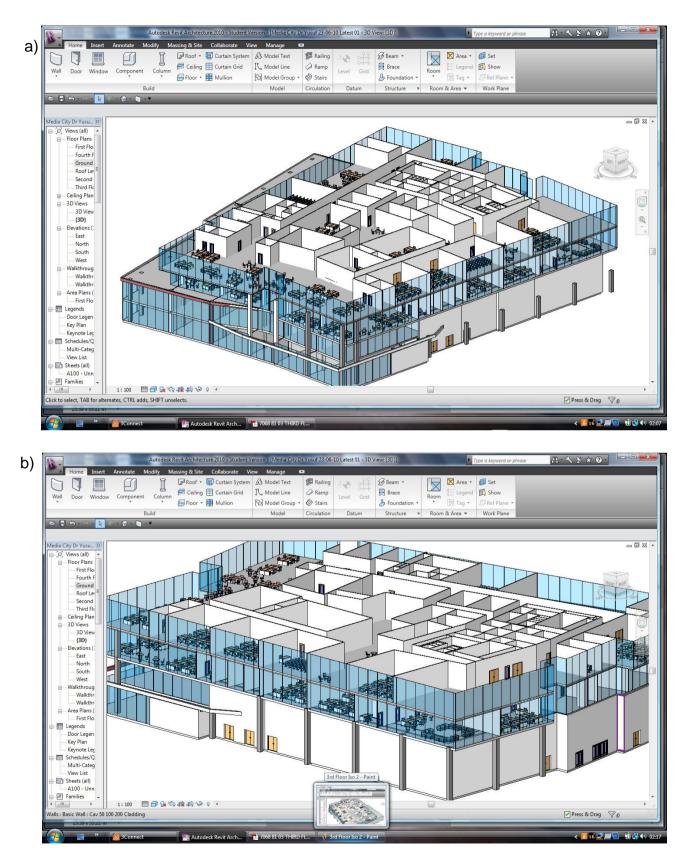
a) Ground Floor Plan b) and First Floor Plan
